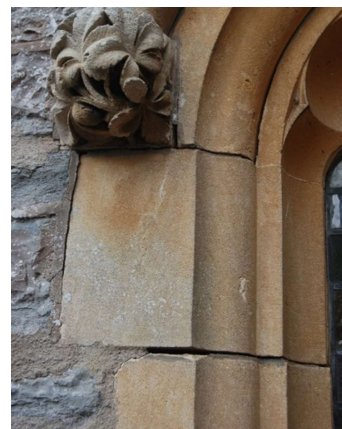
Opening of joints and displacement of stones to the external south jamb.
